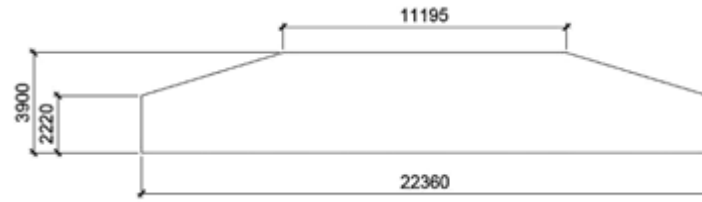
Suggested cross sectional diagram of poultry house structural dimensions
